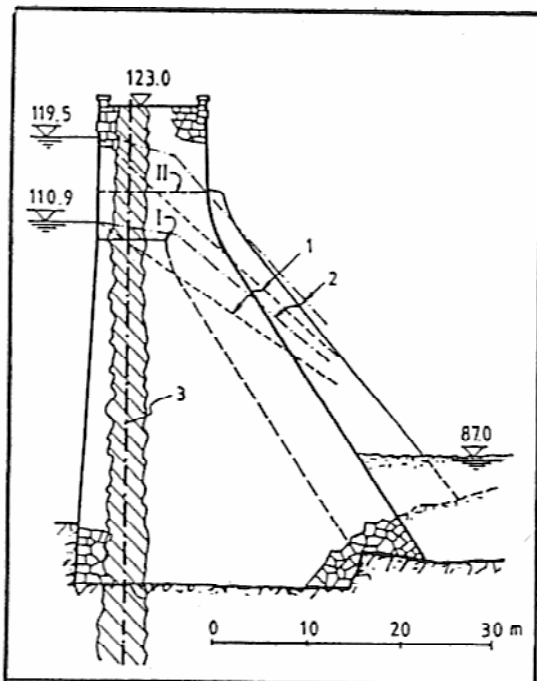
Typical cross section of Aswan Dam and the position of the grout curtain, I and II dam construction phases, 1 linear distribution of uplift pressure in the foundation plane, 2 uplift pressure measured in piezometers, 3 center line of grout curtain (22).
